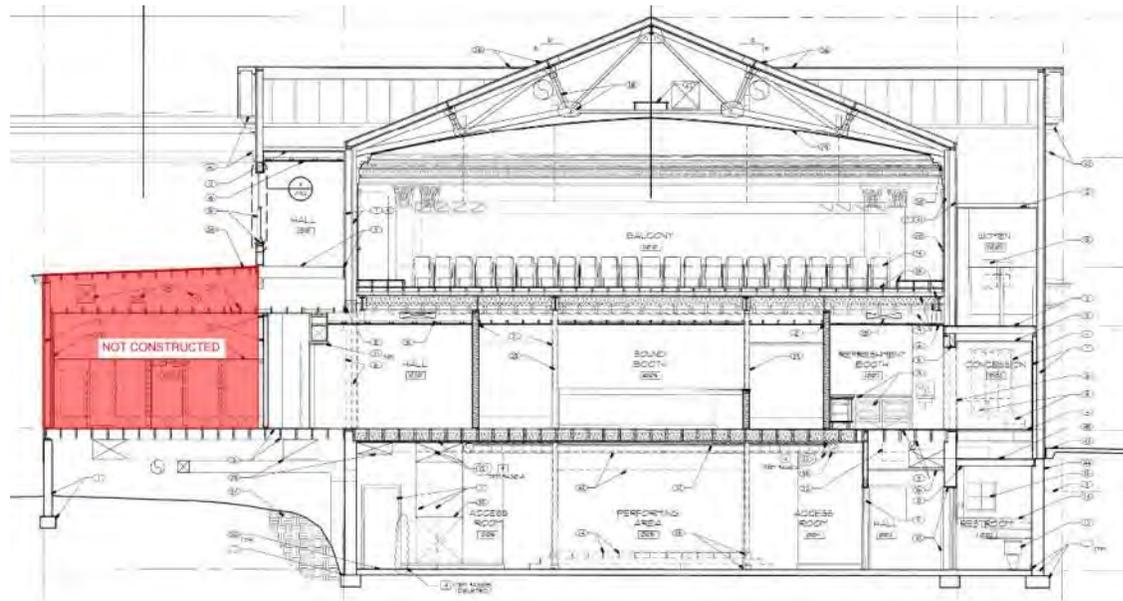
Section through the building from the 2002 Construction Drawings highlighting the portion of the west wing that was not reconstructed.
